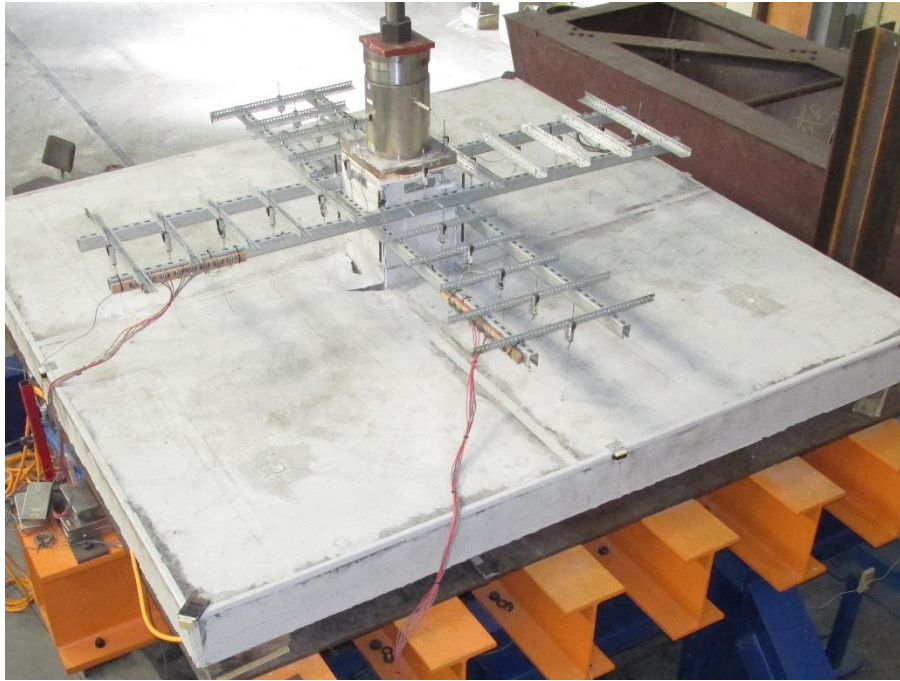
Cracking observed at failure for test specimen #4: U-0.7
